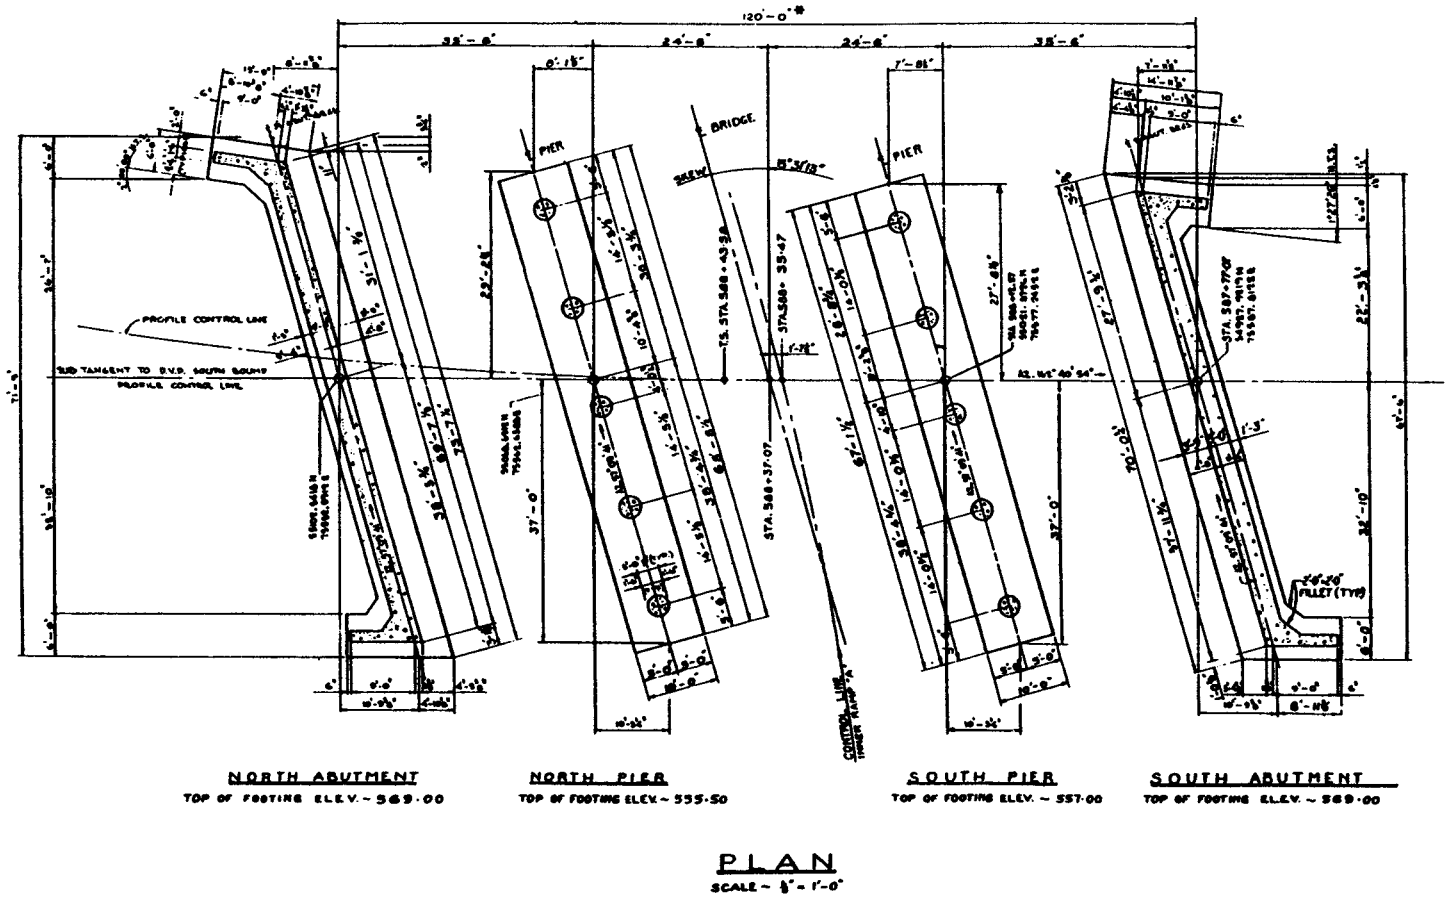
Foundation layout plan for bridge No. 5, Don Valley Parkway. *See same dimension on Figure 15.8.
